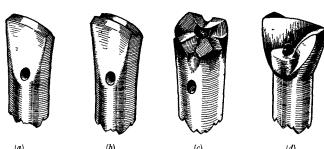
Four Types of Bit used for Drilling Bore Holes.
